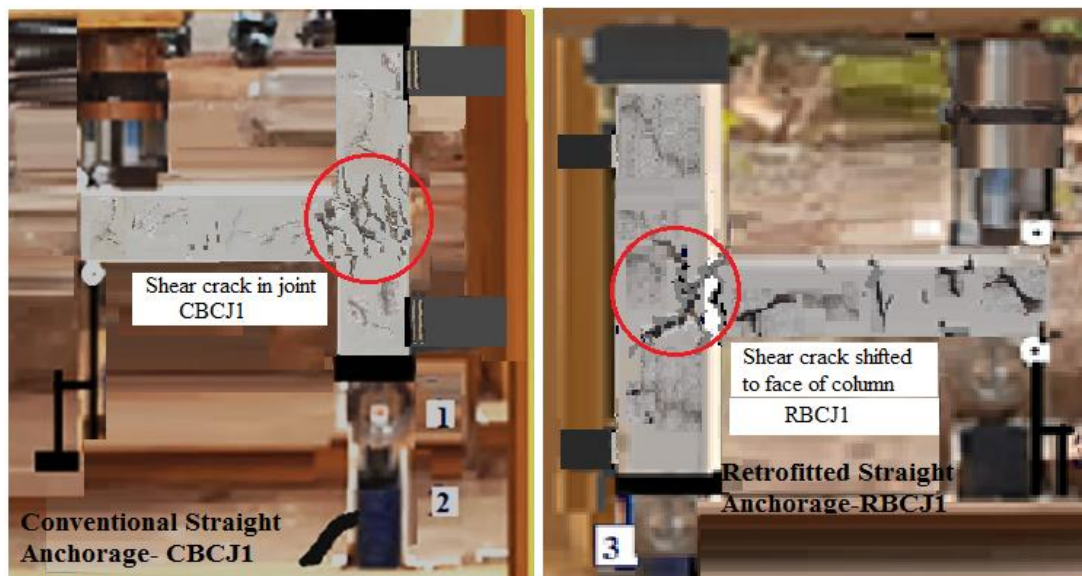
Crack pattern in Straight Conventional & Retrofitted Anchorage
